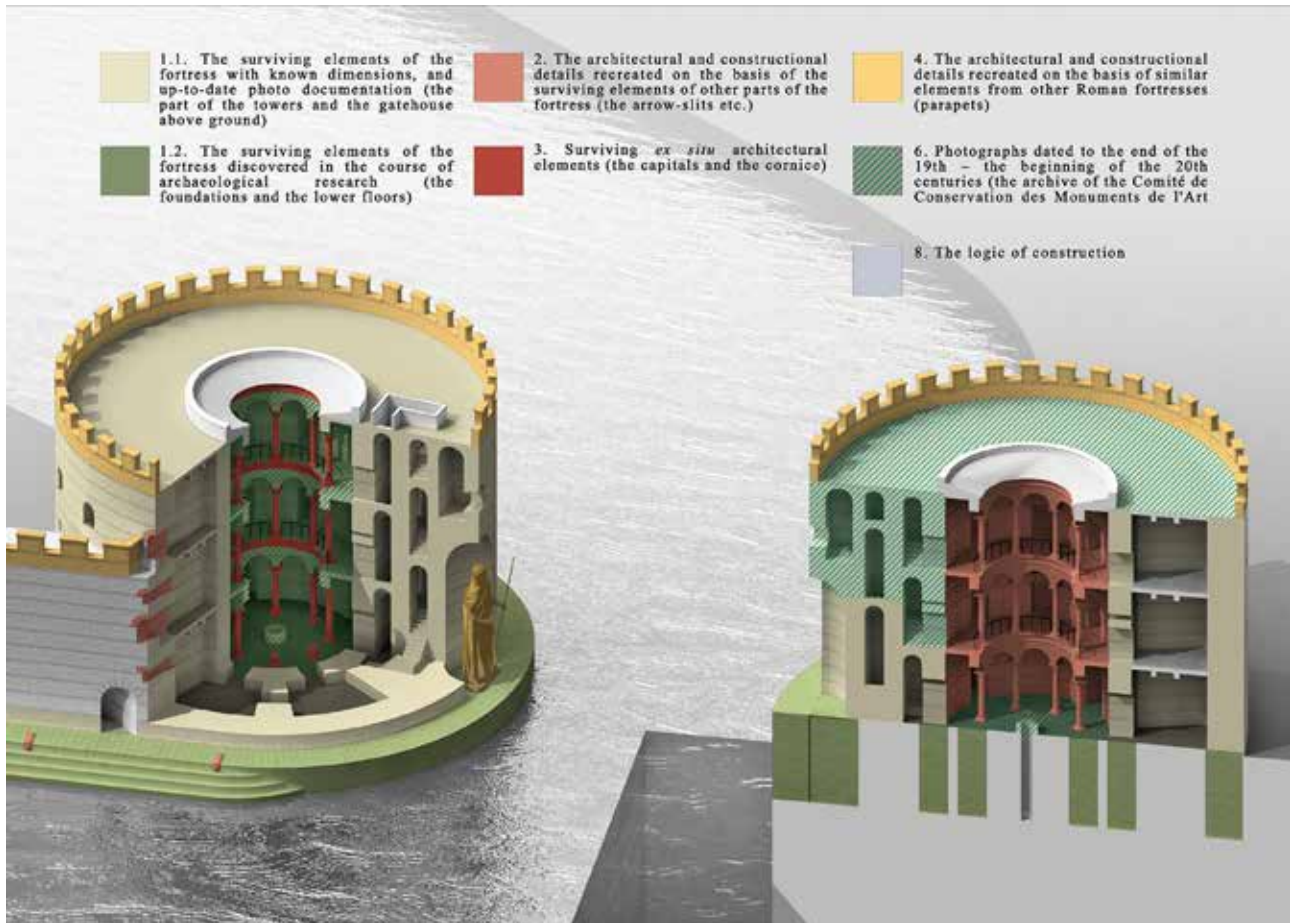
Reconstruction of the Round Towers of the fortress of Babylon. Axonometric view. 3D-modelling with key showing connection between details of the reconstruction and their sources. Reconstruction by the authors
